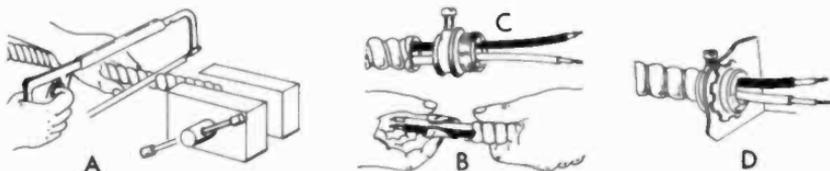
How to handle flexible armored cable: "A" Grip the cable in a vise about 8" from the end and cut *diagonally* across the face of one spiral section. Be careful not to cut into the cable. Flex the cable sharply and the cut piece will break off. Slip it off the wire conductors. "B" Insert a split insulating bushing between the outer jacket and the first layer of insulation. "C" Slip a coupler onto the outer armor, snug up against the fiber or plastic bushing and end of the armor. "D" Take the locknut off the coupler. Place the cable into a knockout hole in the box. Put the locknut back on and tighten firmly. Skin about one-half inch of insulation off the ends of the wires.
